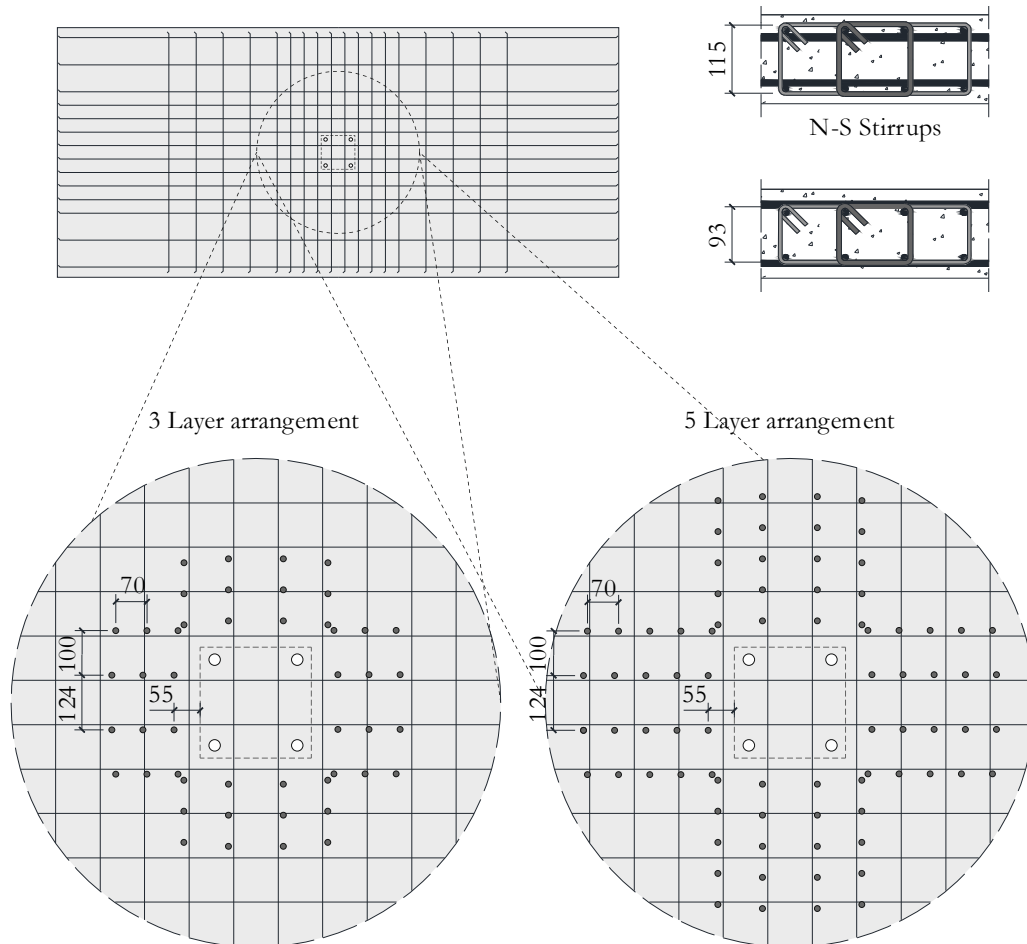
Arrangement and details of the stirrups. Dimensions in millimetres.
